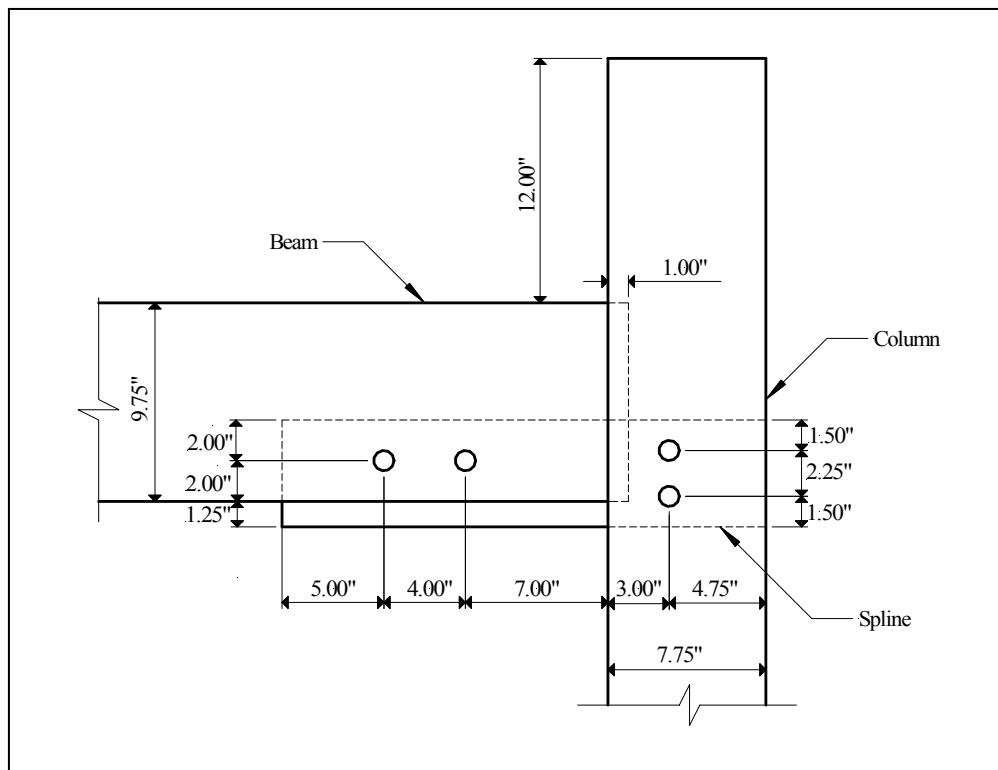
Typical Beam-to-Column Joint Detail
